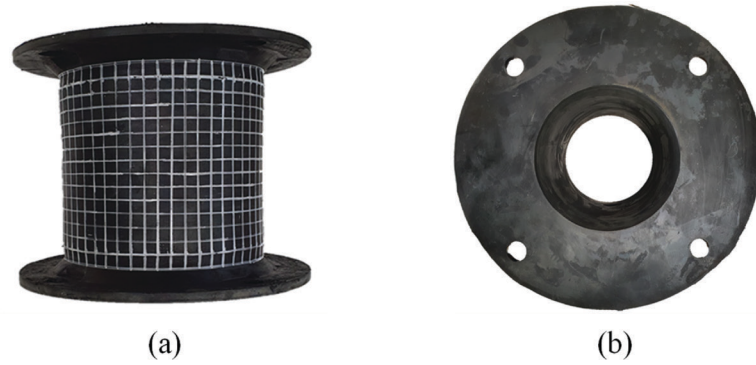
Circular tube-shaped rubber fender used for crushing test: (a) front view, and (b) top view
